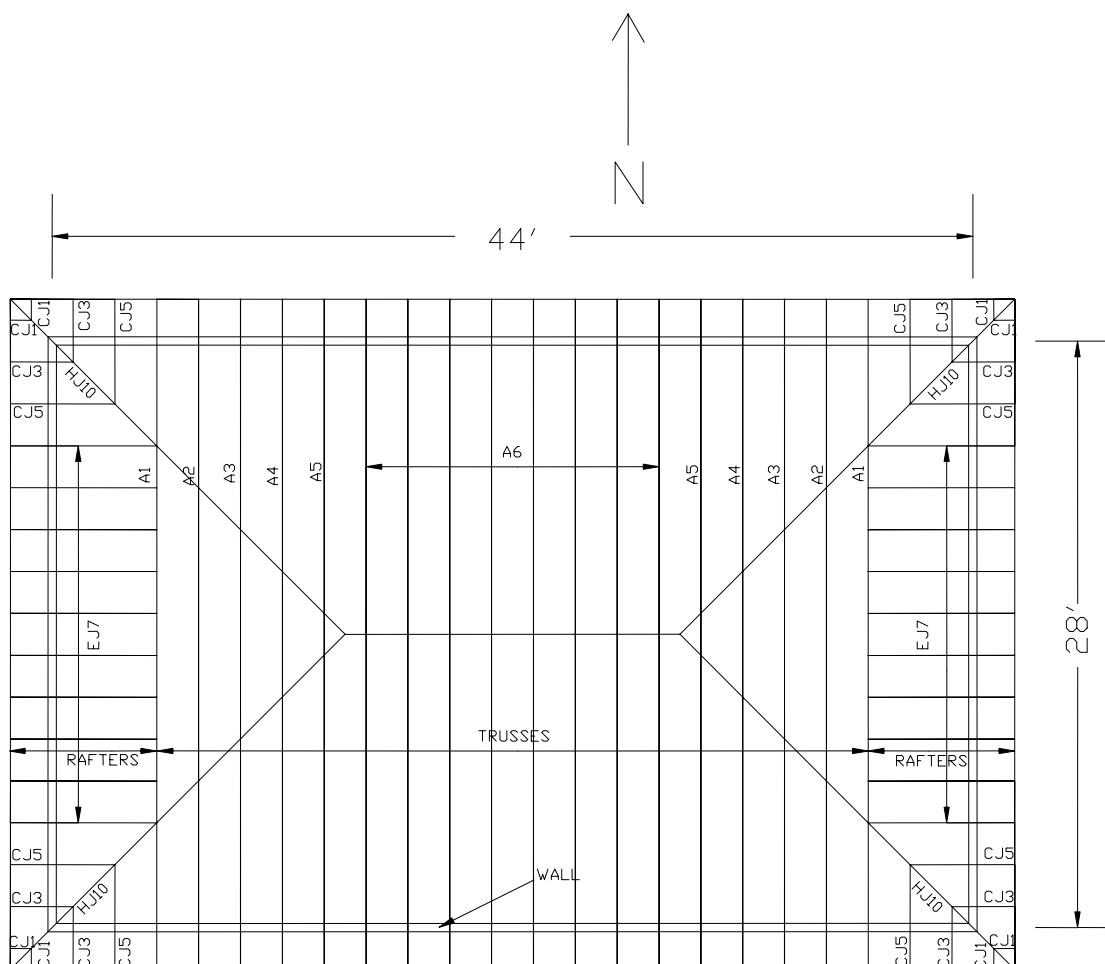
Plan view of hip roof (J. M. Harold Construction, 2006)
